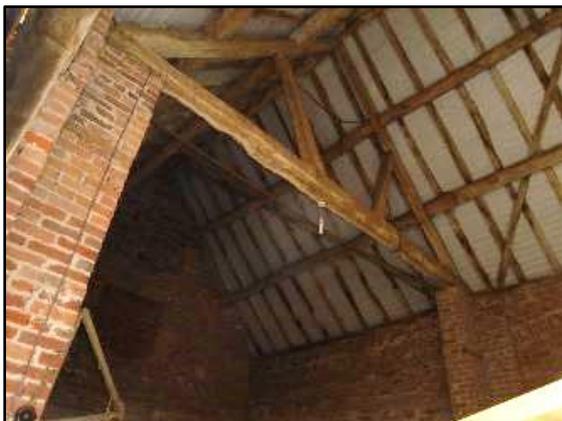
Showing a typical view of the barn interior. Photograph looking north-east.
